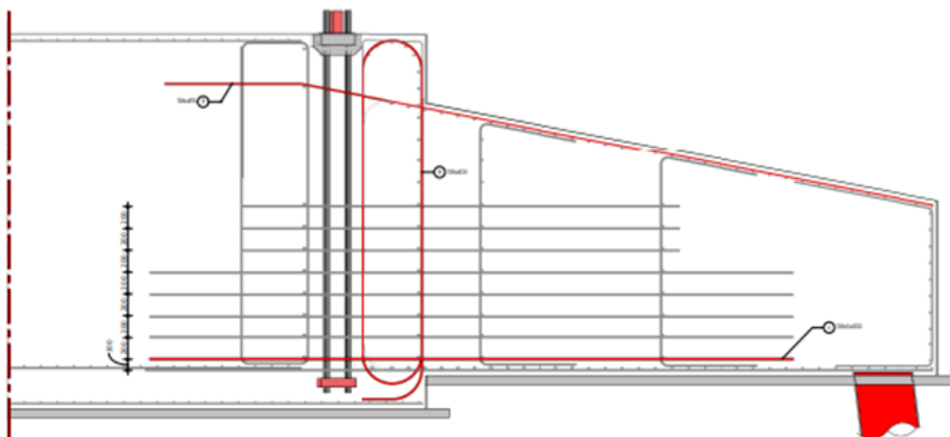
Cross section of the foundation with the reinforcements in interest
